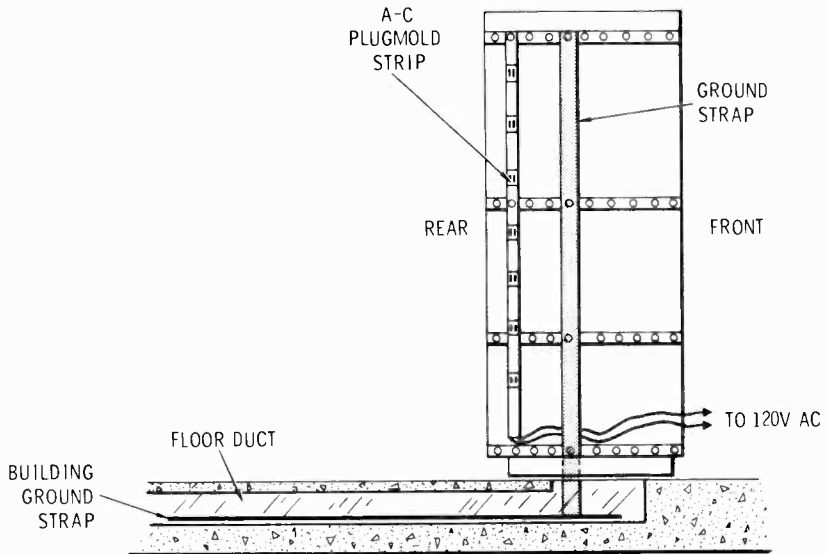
Power is supplied in a rack by tying a plugmold strip into the a-c power. Equipment may then be plugged into a-c outlets on the strip for a quick disconnect. Note also how the copper ground strap is mounted inside the rack and soldered to the building ground bus.
